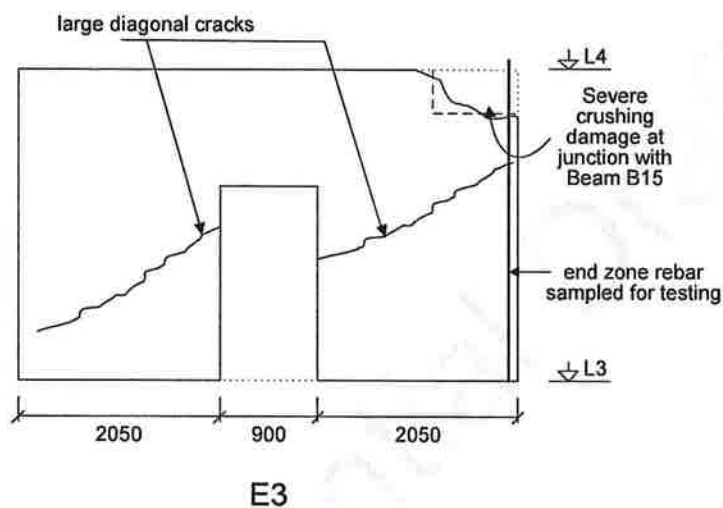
Line 1 South Wall remnant E3, Level 3 to 4.
